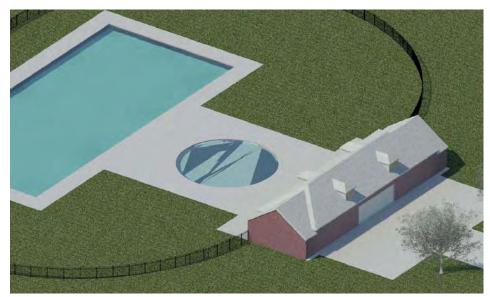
Northeast bird's-eye view showing building re-clad in brick with wings removed.
